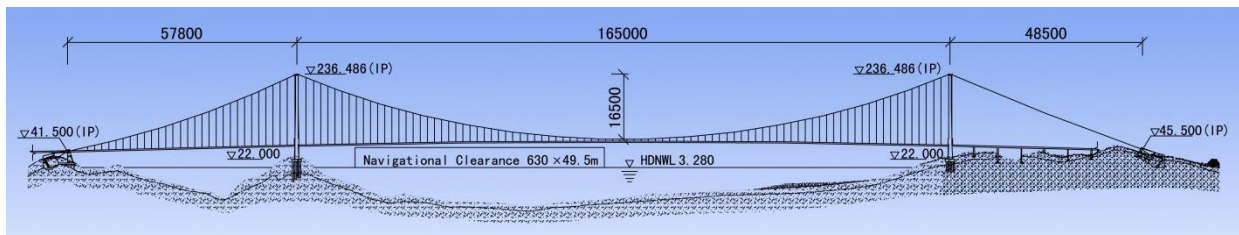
Longitudinal arrangement of Xihoumen Bridge (Unit: cm)
